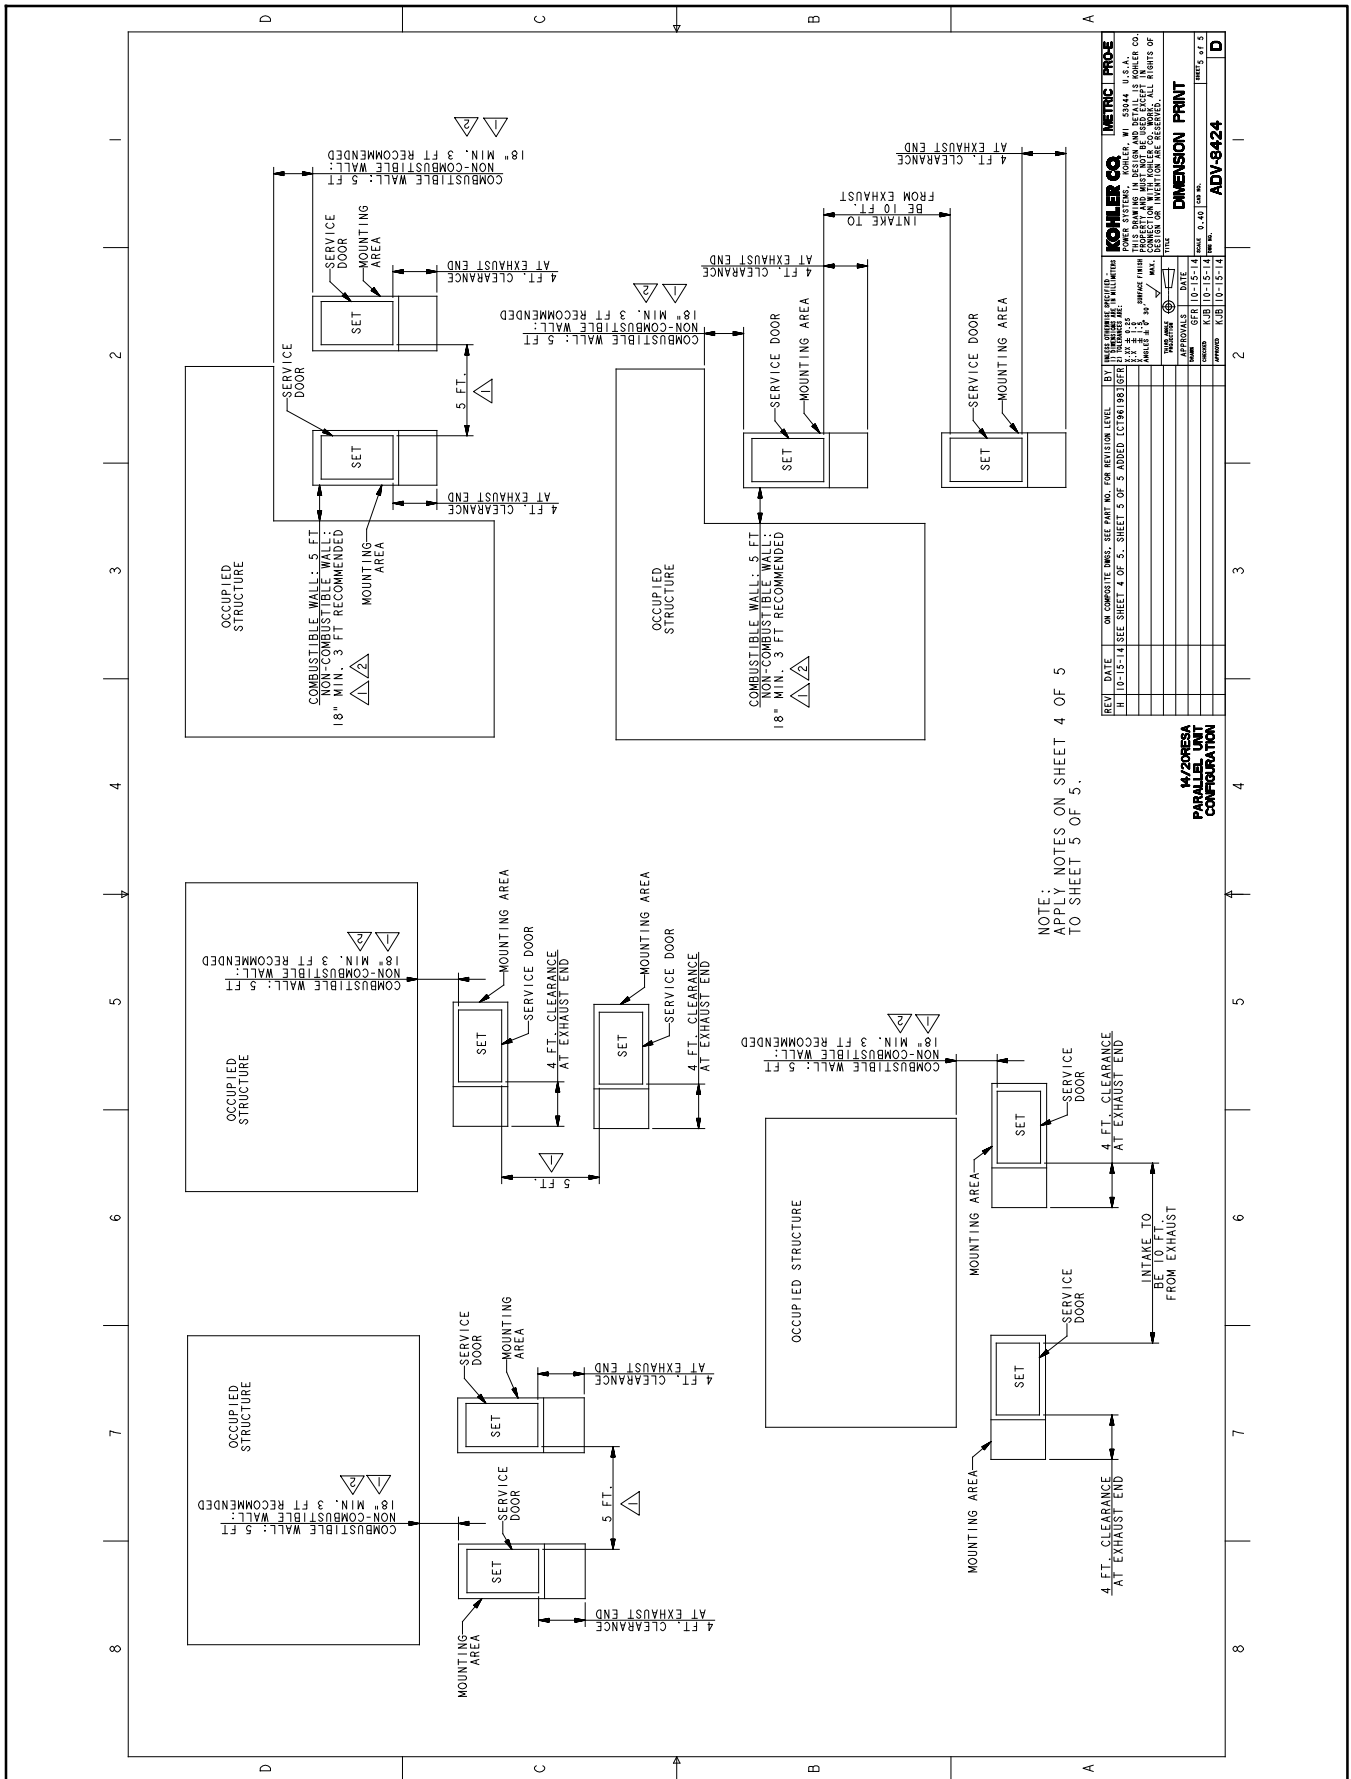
Dimension Drawing ADV-8424, Sheet 4 of 5
